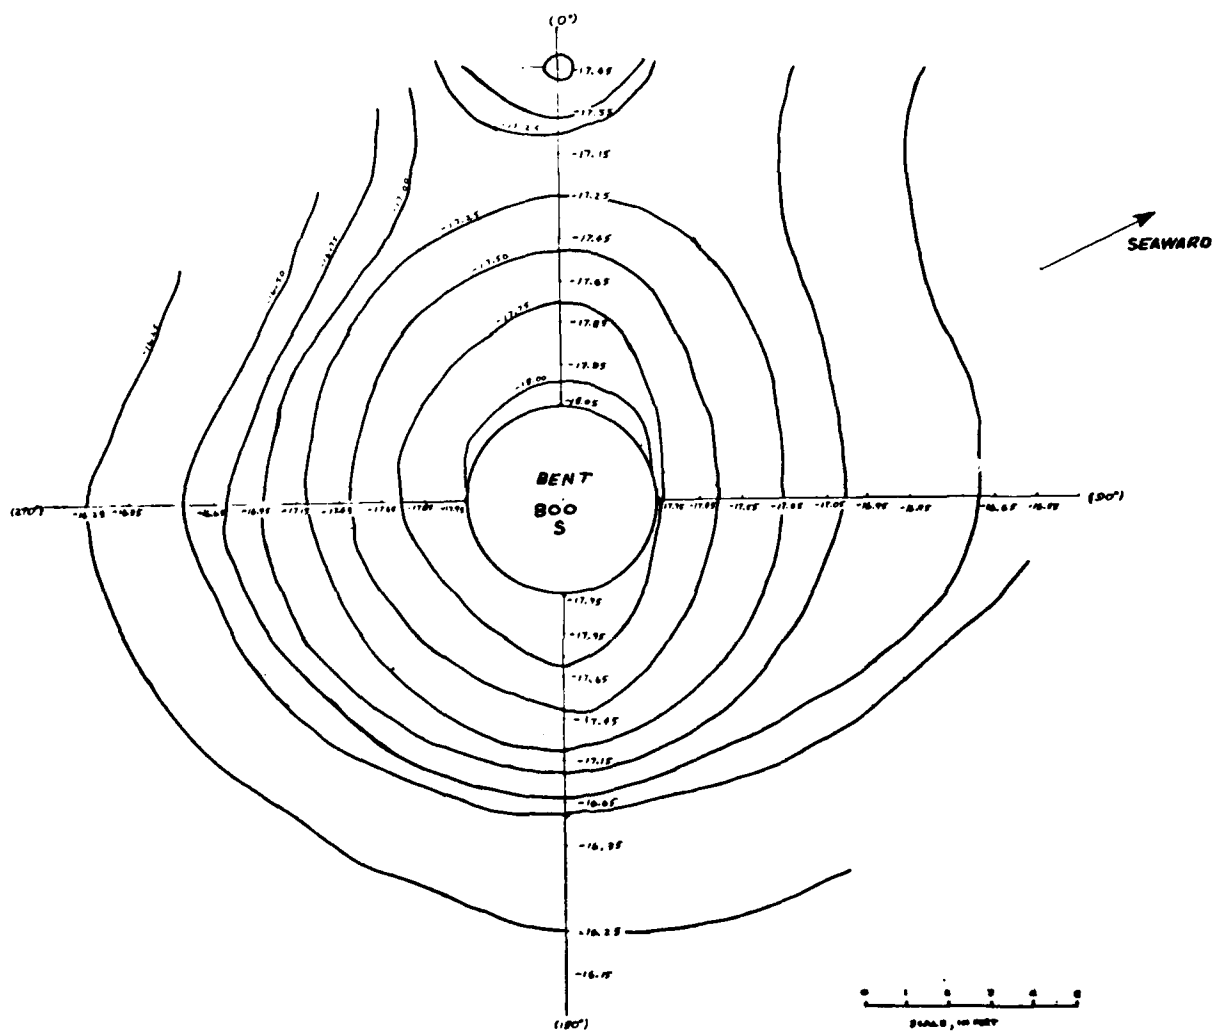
Scour at Pile 800-S, 8 August 1979, CERC Pier (Depths in Feet Below MSL)
